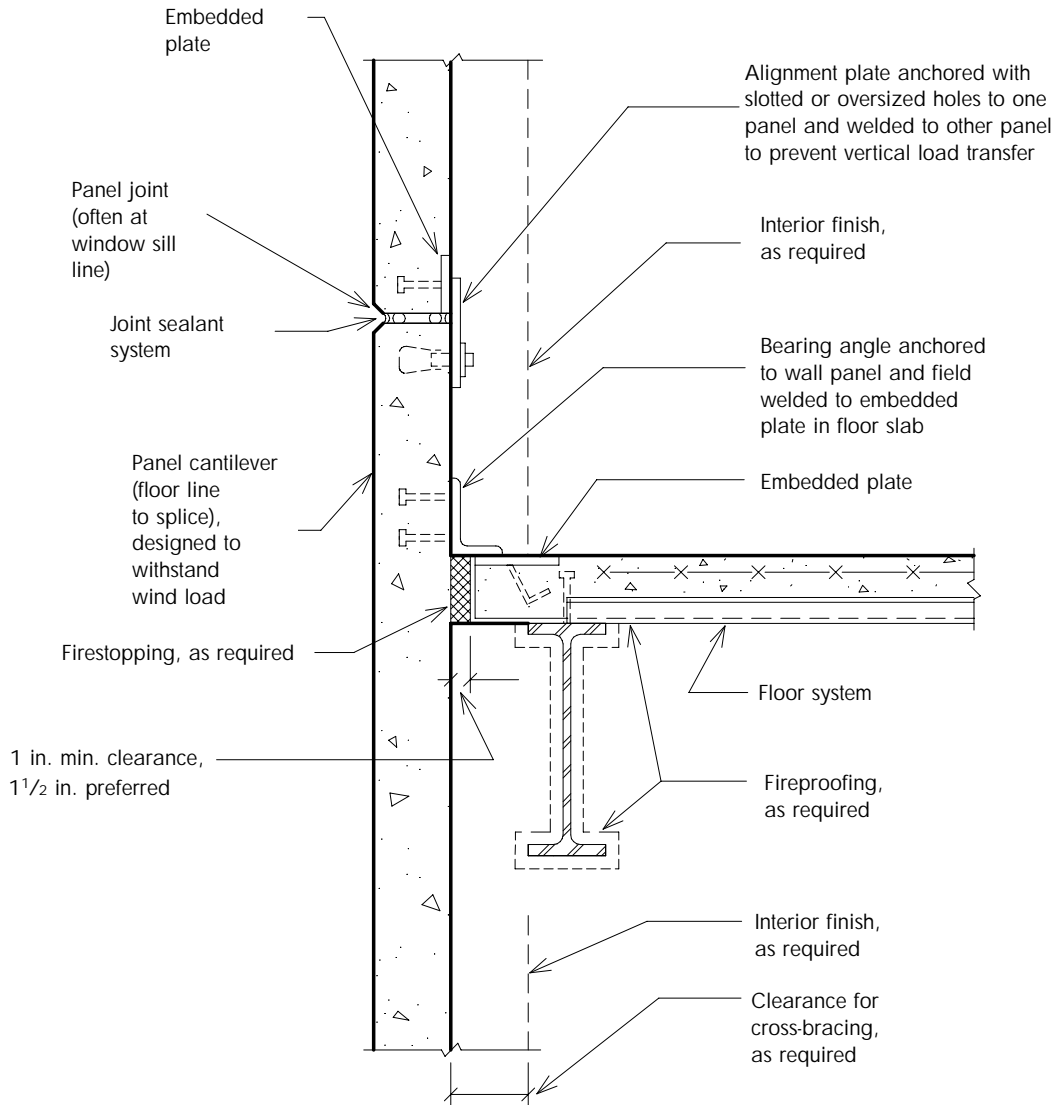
Detailing Considerations for Precast Concrete Panels (Sample Wall Section Detail at Vertical Span Precast Panels)
